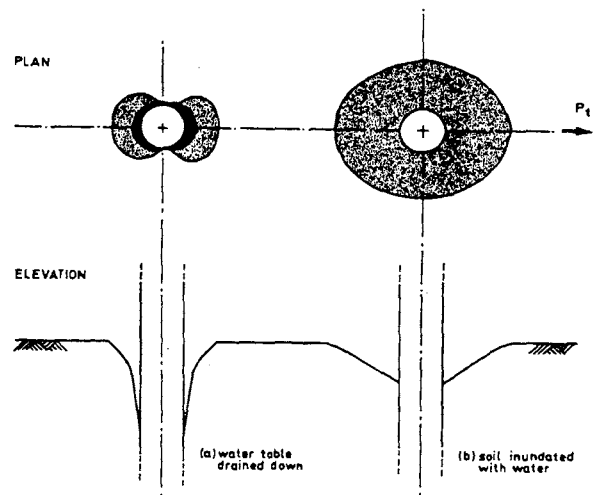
Erosion Zones around Single Piles after Cyclic Loading.
